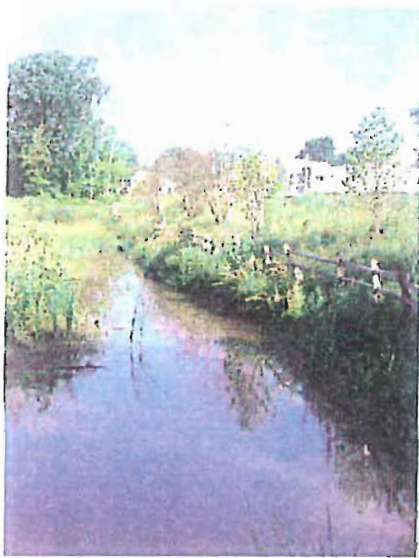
Plumbrook Drain streambank stabilization (Sterling Heights, MI)
